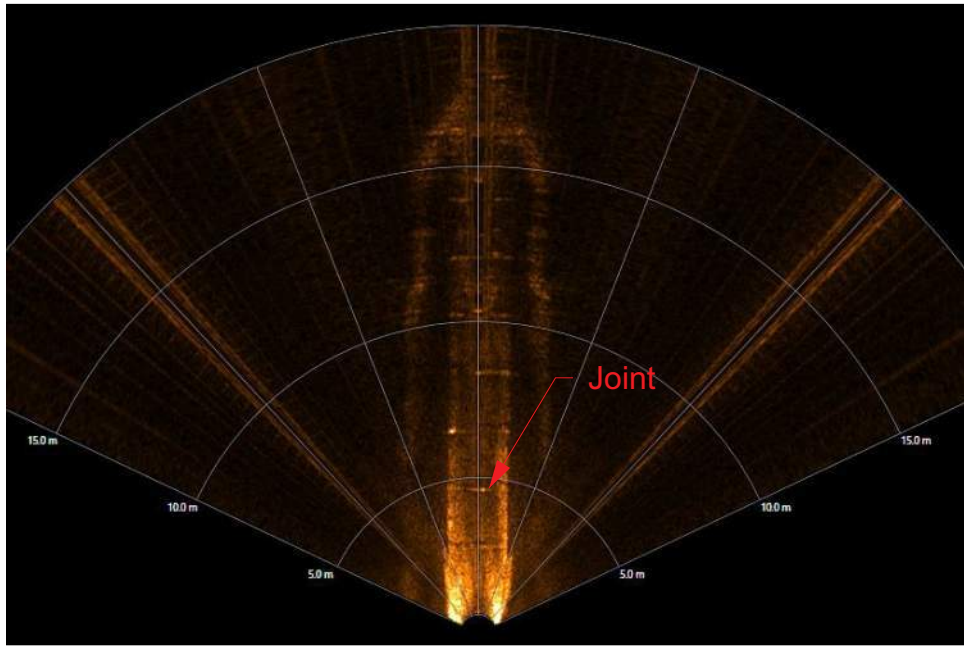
Sonar image at 737 feet downstream of Access Point 1. Joint spacing visible.
